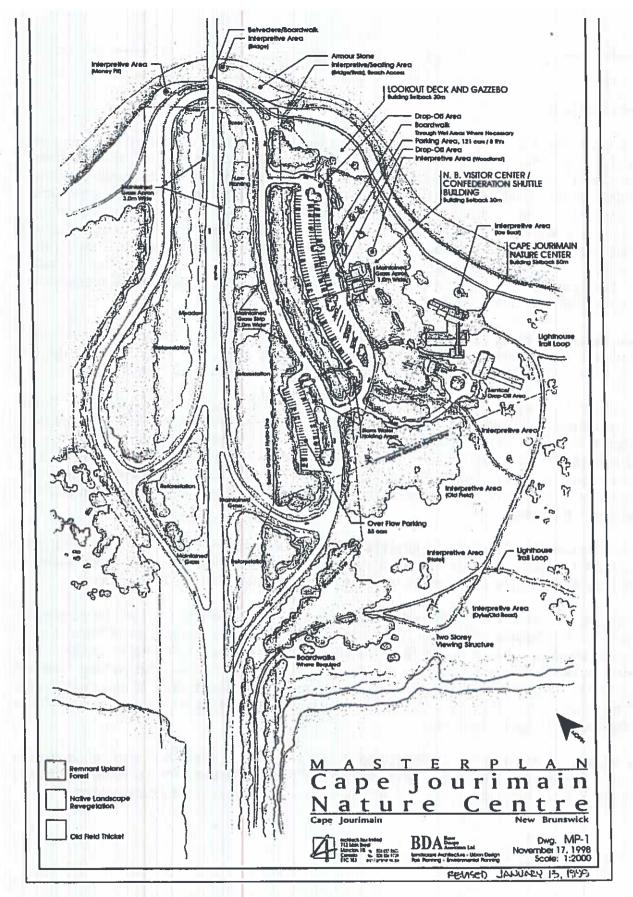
Draft site plan of the Cape Jourimain Nature Centre Project
